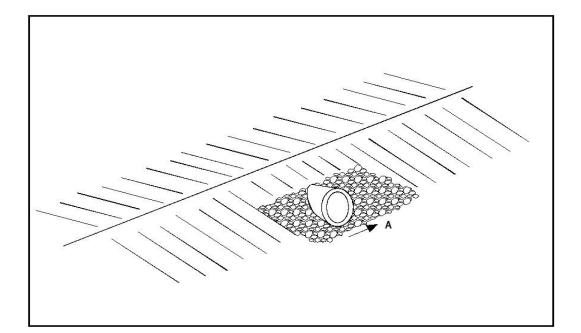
below shows a concrete headwall and rip-rap embankment toe protection.
